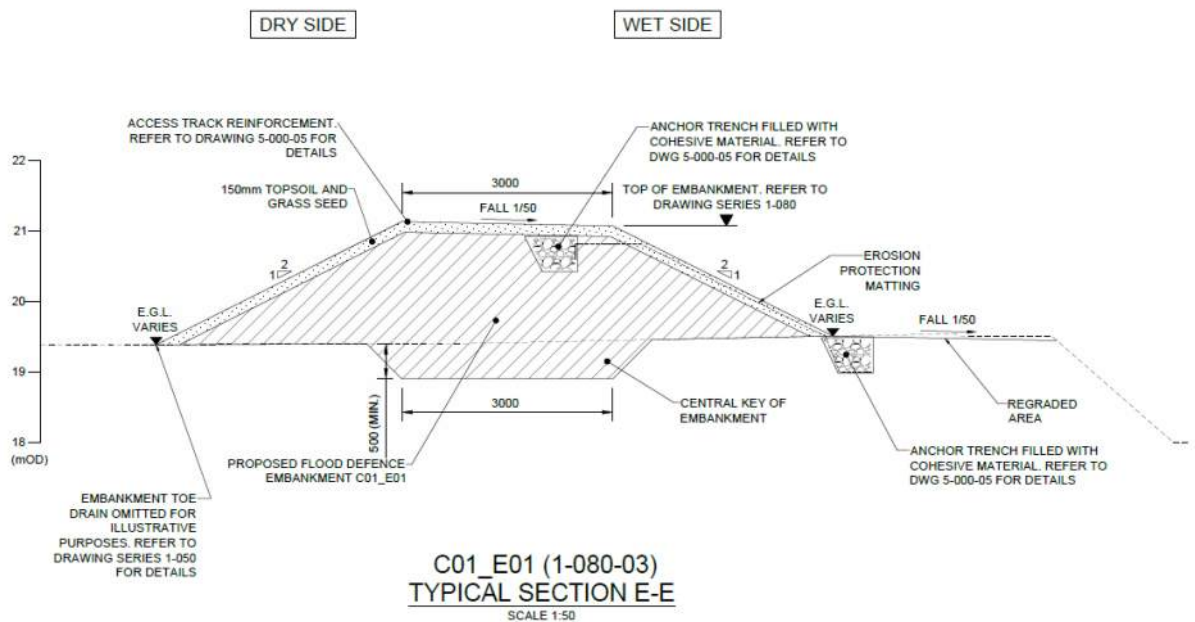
Proposed Sallybrook Flood Defence Embankment Typical Section
